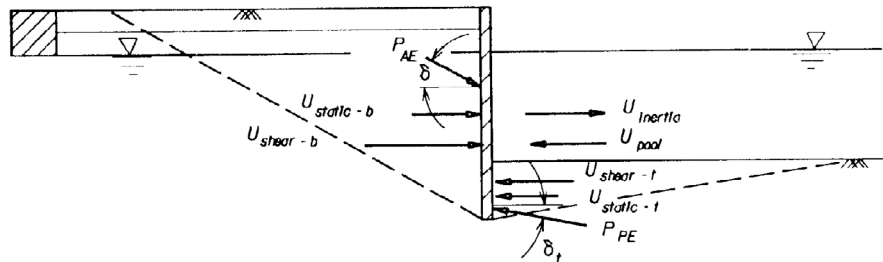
Anchored sheet pile wall with excess pore water pressures generated during earthquake shaking (Case 2)
